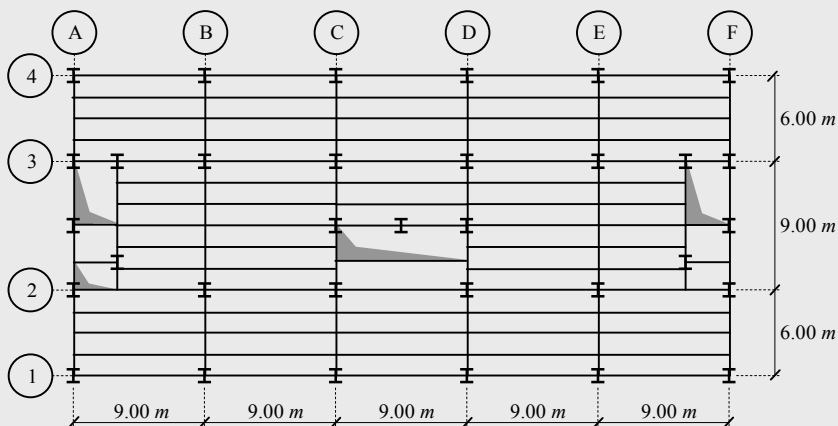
Plan of the 8<sup>th</sup> floor
